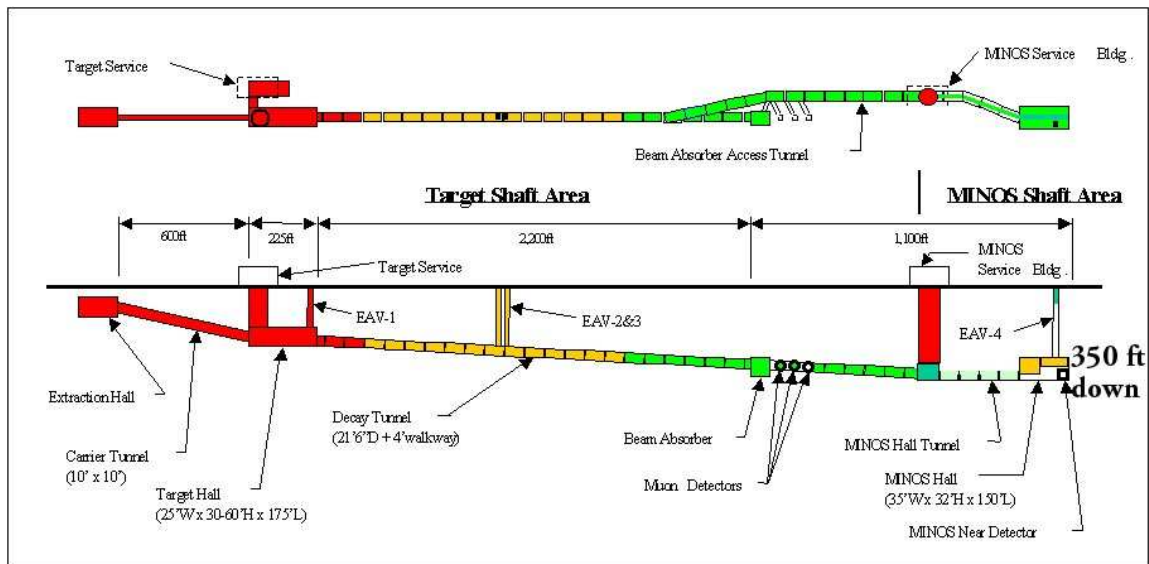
Plan and elevation views of the NuMI beamline, including the MINOS near detector hall 350' underground.
